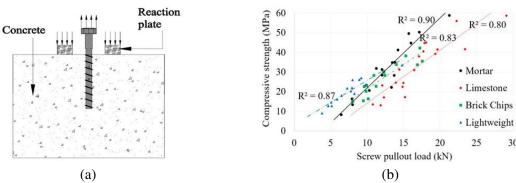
PSP test: (a) Loading arrangement, (b) Concrete strength versus screw pull-out load
